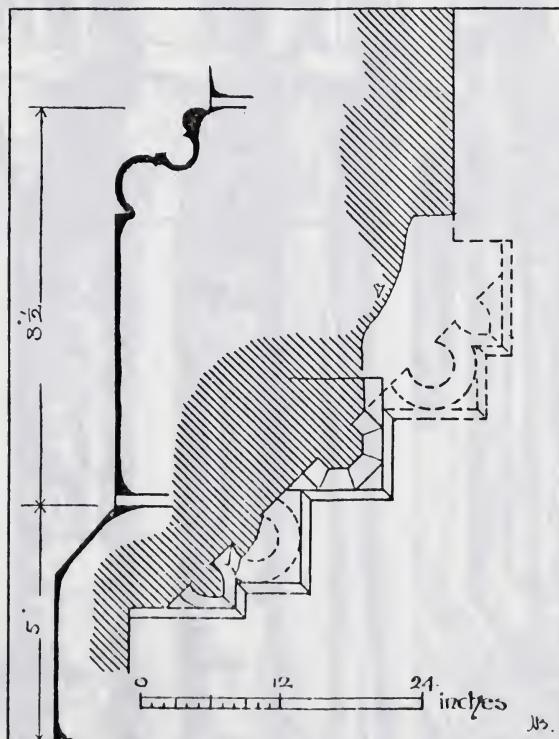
THE DARK ENTRY, PLAN OF JAMB AND SECTION OF BASE.
